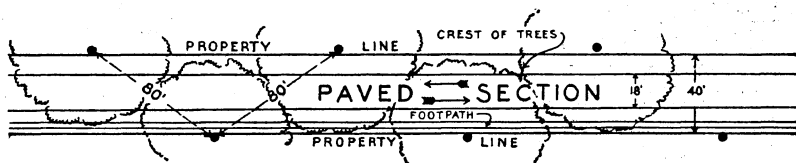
A 40-foot right of way with an 18-foot improved road and a formal planting on the adjoining properties. In all formal plantings like this and those shown in Figures 19, 24, and 27 one kind of tree should be used for long distances. Ordinarily these distances should be measured by miles or by distance from village to village or hilltop to hilltop
